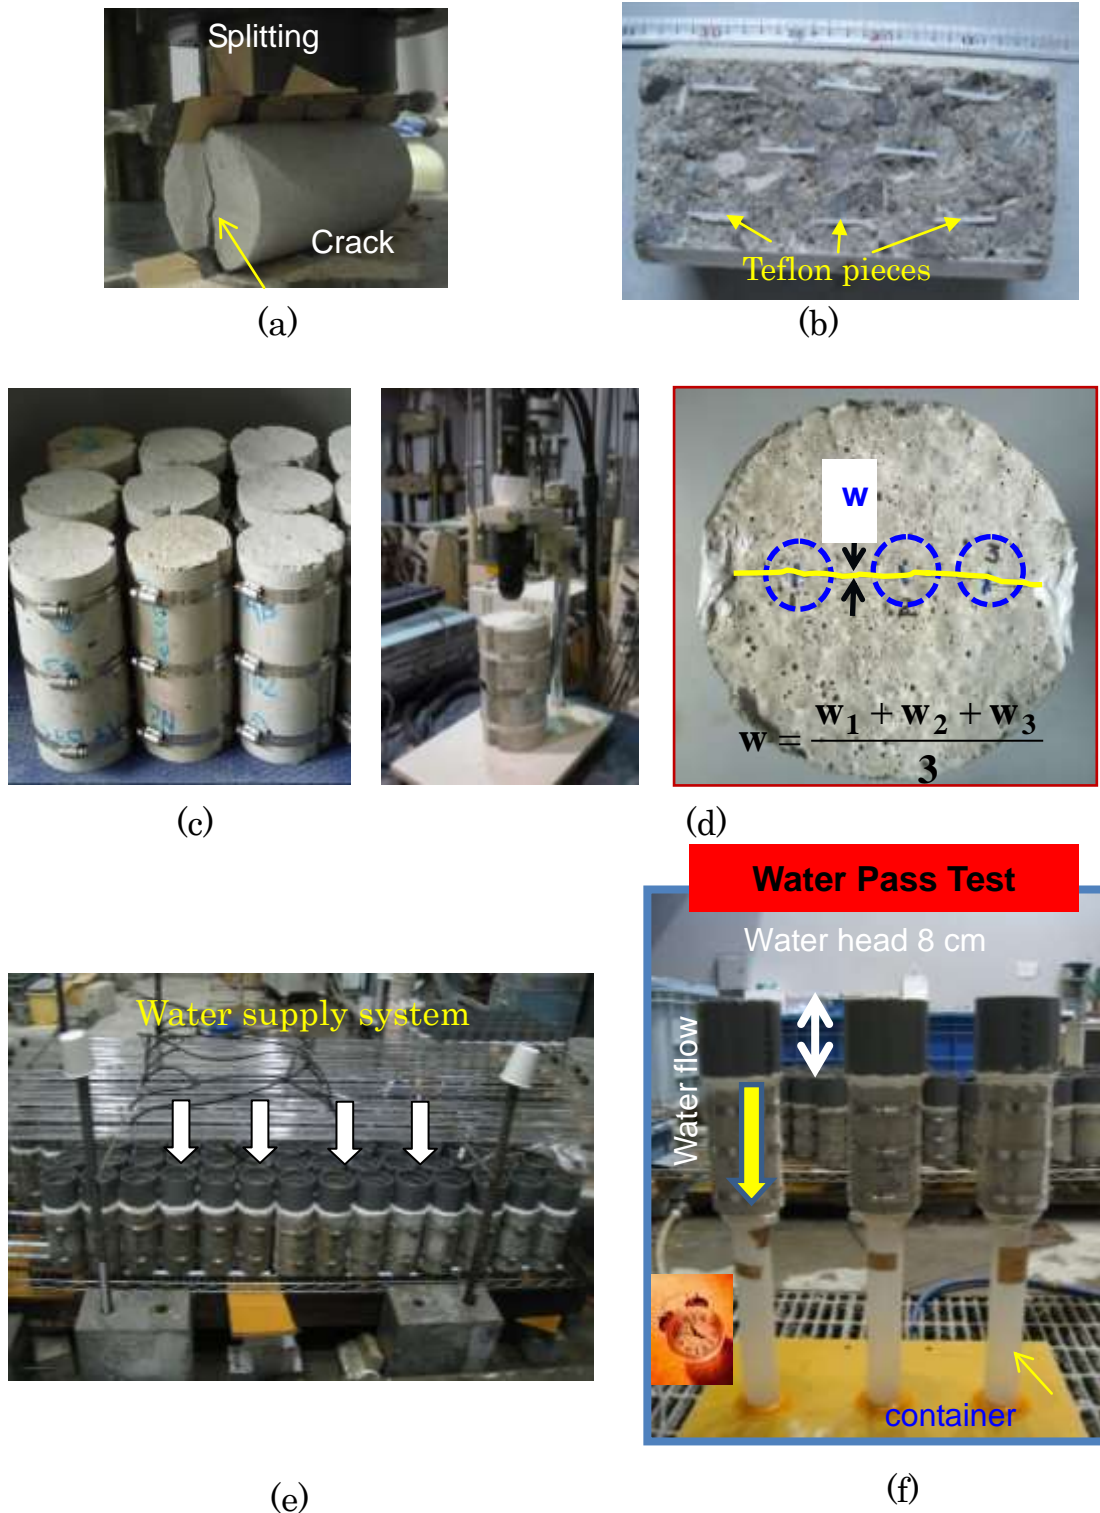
(a) Inducing a penetrating crack; (b) Arrangement of
